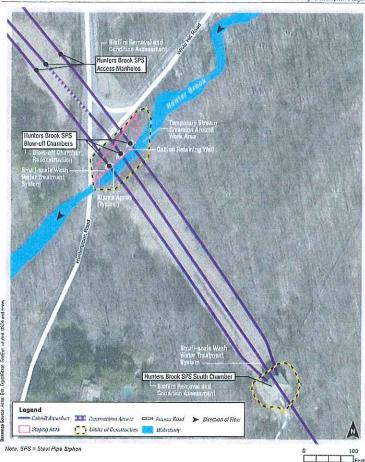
Site Plan for Hunters Brook SPS Blow-off Chambers and Hunter Brook SPS South Chamber – Jacob Road Study Area
